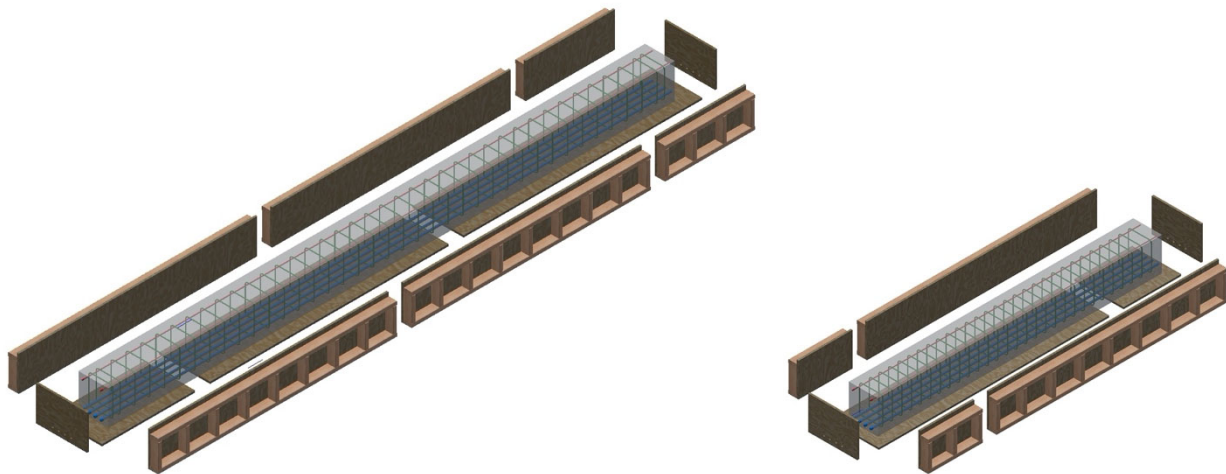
Exploded view of formwork for flexural beam and shear beam.
